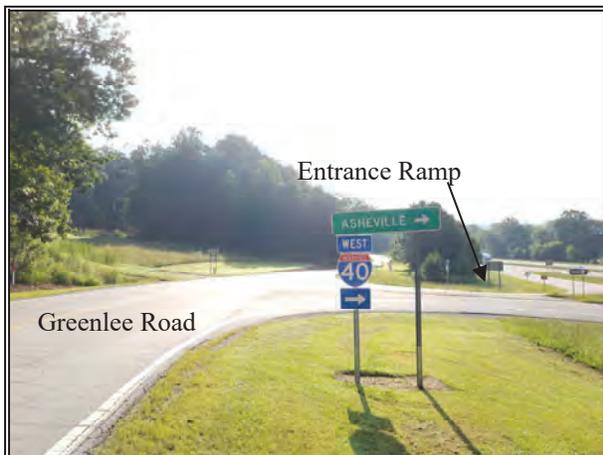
View of northwest quadrant, looking east toward intersection with SR 1240.
